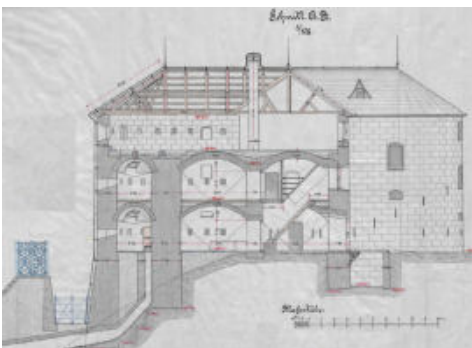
Section A-B, Rapports plan from 1902 (War Archive, Vienna)
